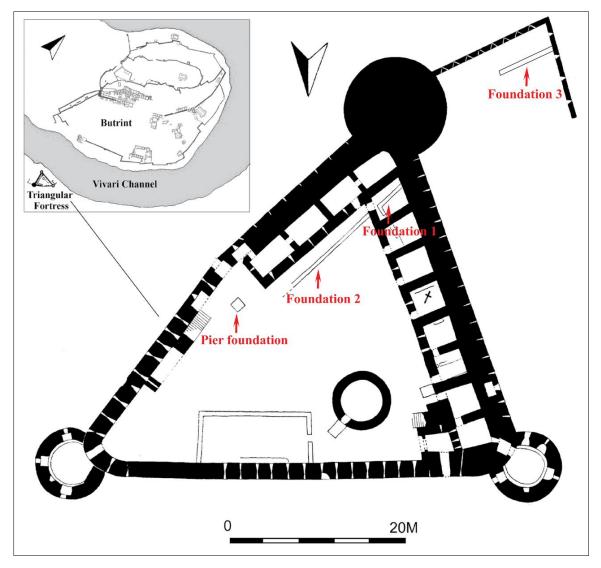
Location of foundations 1, 2, 3 and the pier foundation
